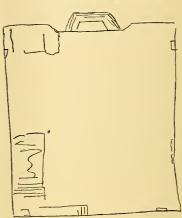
Ground-plans of a hall drawn from memory (scale 1:96).
